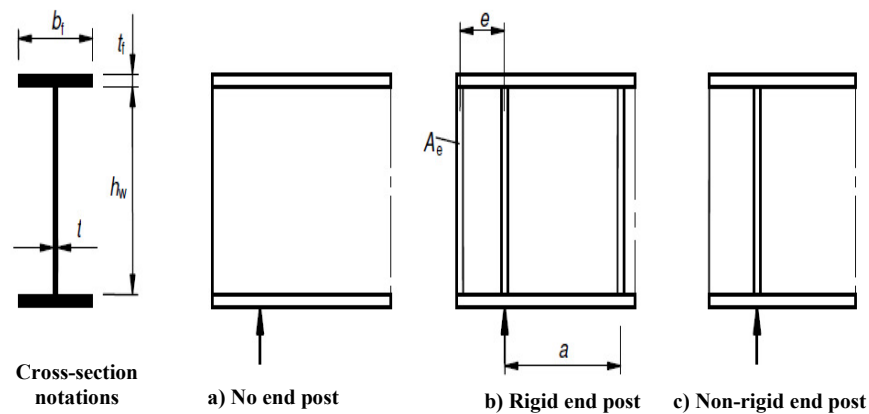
Types of end posts/ external stiffeners of plate-girders (ENV 1993-1-5, 2006)
